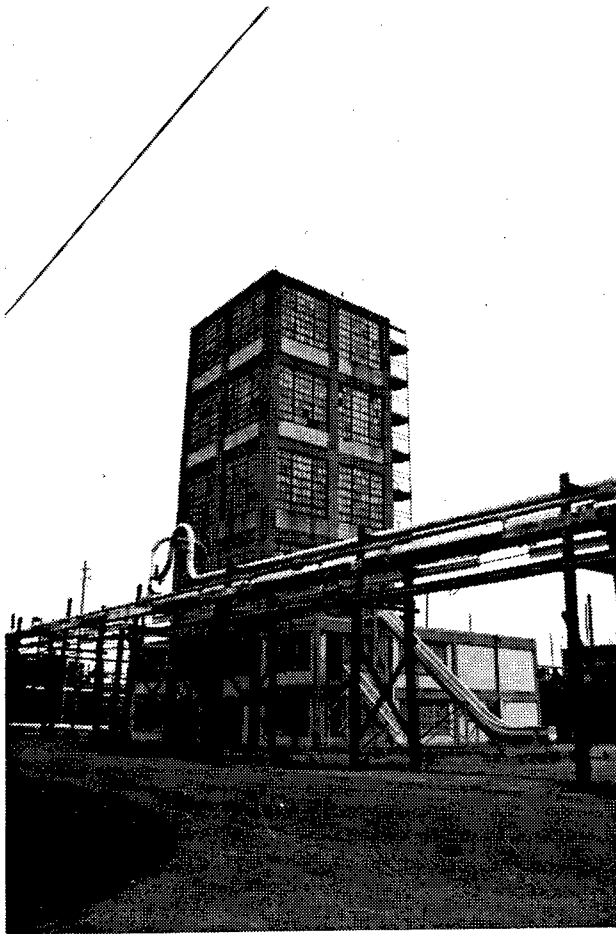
Building B9: Acid Manufacturing Plant, Primary Recovery and Sludge Treatment Building.
